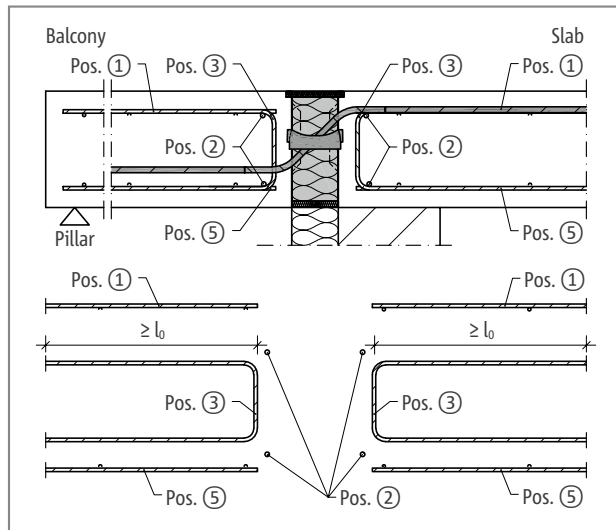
Schöck Isokorb® T type Q-E-V: On-site reinforcement
